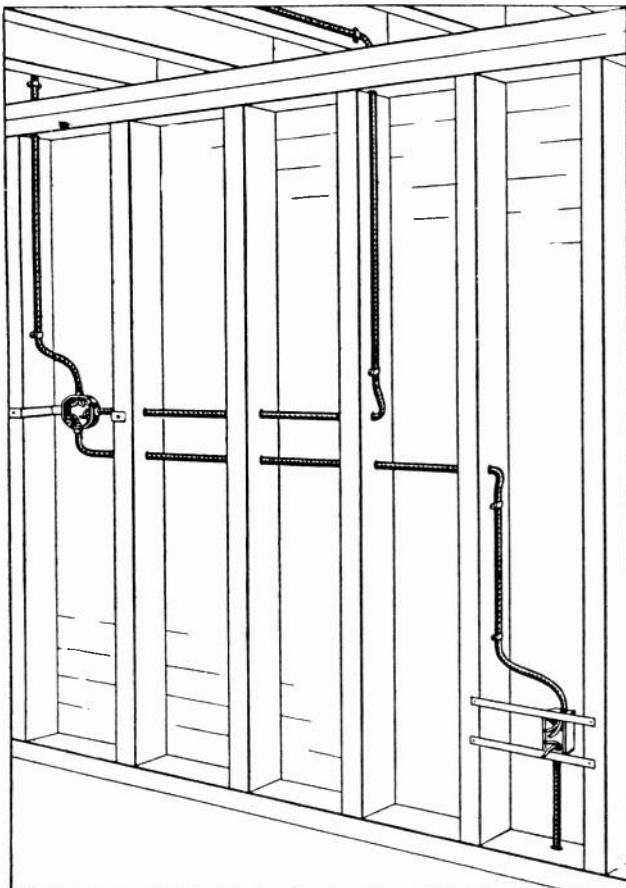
A section of an installation of RomeX, showing how it is run through and along joists of a building.
